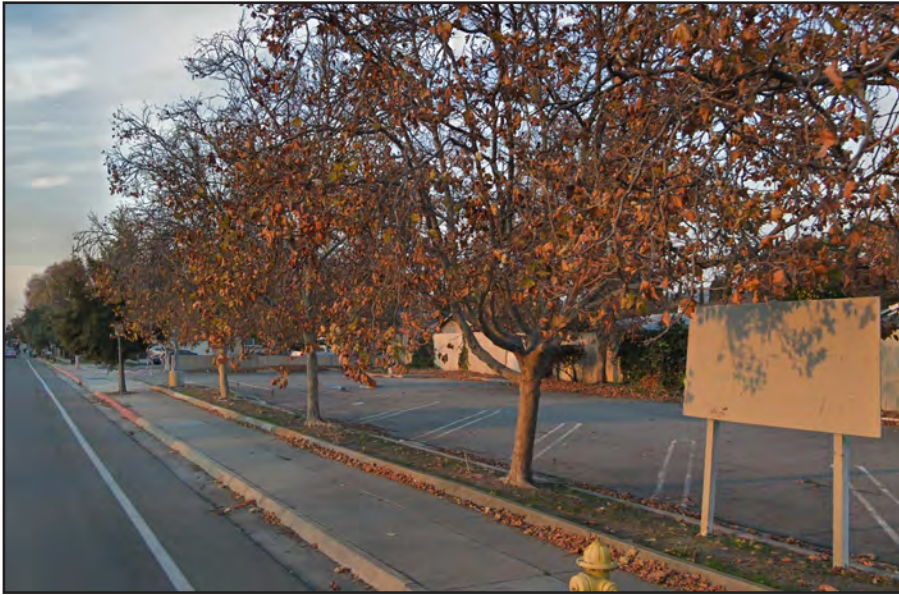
View of the project site looking northwest, showing the existing parking lot and Capitol Avenue.
